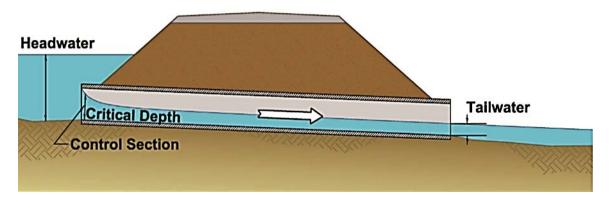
Typical Inlet Flow Control Section (Schall et al. 2012)
